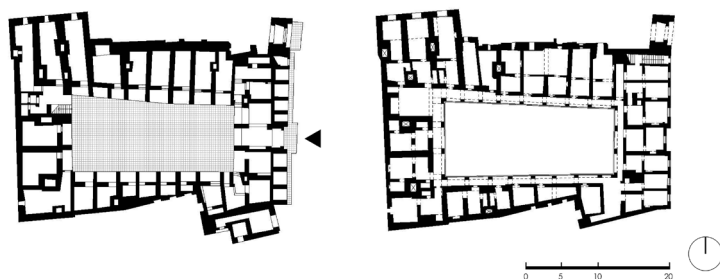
Ground floor and first floor plan of the Wikala Bazar'a. Cairo (Manlio Michieletto, 2025)
